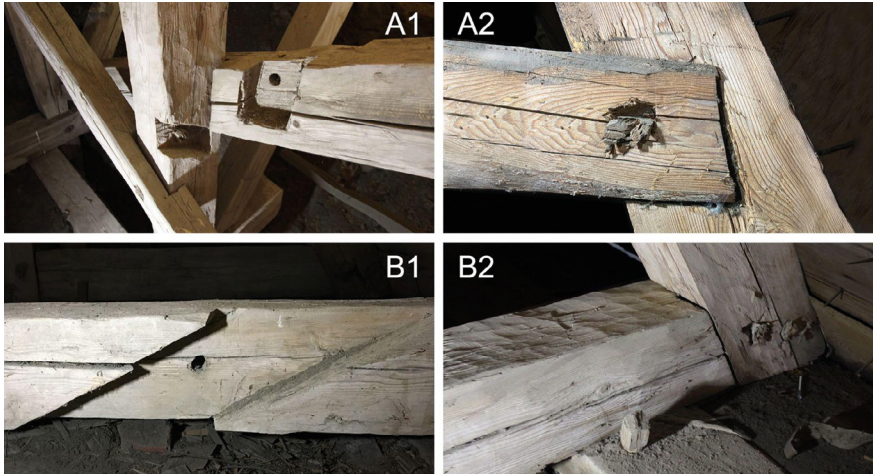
Notches and joints in the nave roof structure of Pyhtää Church. (A1) An discontinuous lap joint in an ashlar post and a wind brace © PANU SAVOLAINEN (2022). (A2) A discontinuous lap joint connecting a rafter and a collar beam © MARKO HUTTUNEN (2022). (B1) Simple lap joint notch in a sole piece © MIA PURANEN (2022). (B2) Simple lap joint connecting sole piece and rafter © PANU SAVOLAINEN (2022)
